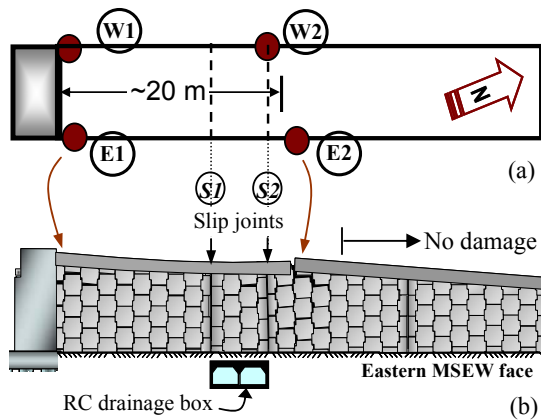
Reinforced bridge approach (a) plan view of damage-concentrated locations; (b) schematics of eastern wall face after the earthquake.
